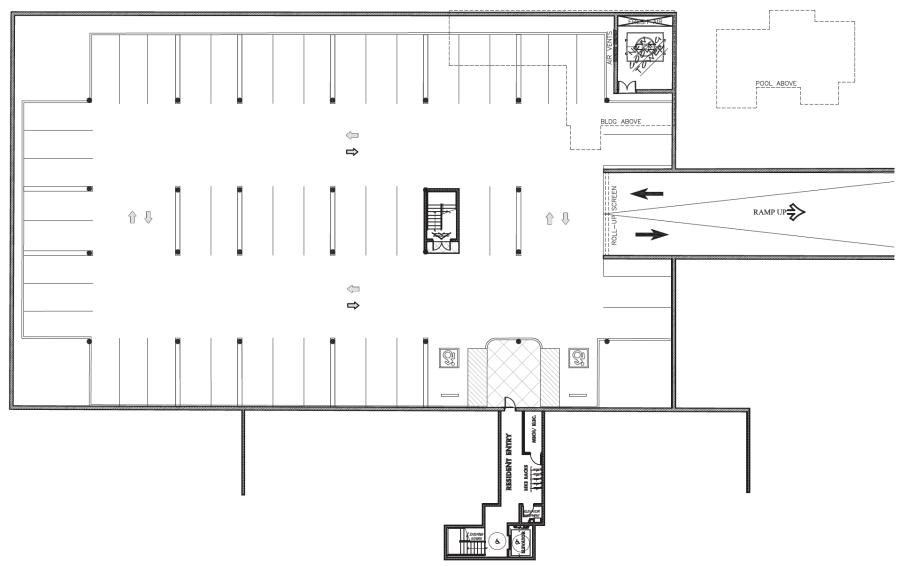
DEVELOPMENT / CONCEPTUAL SITE PLAN
